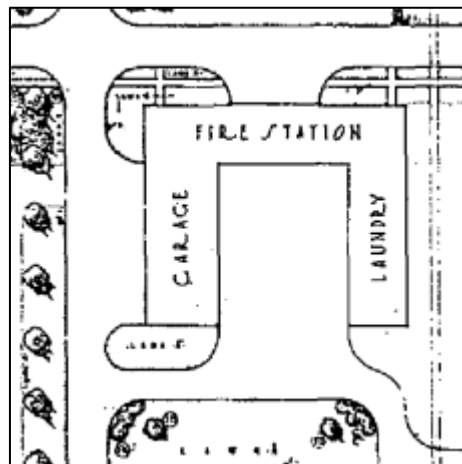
Building 15 shown on 1933 US Naval Air Station (NAS) Sunnyvale landscape plans.
